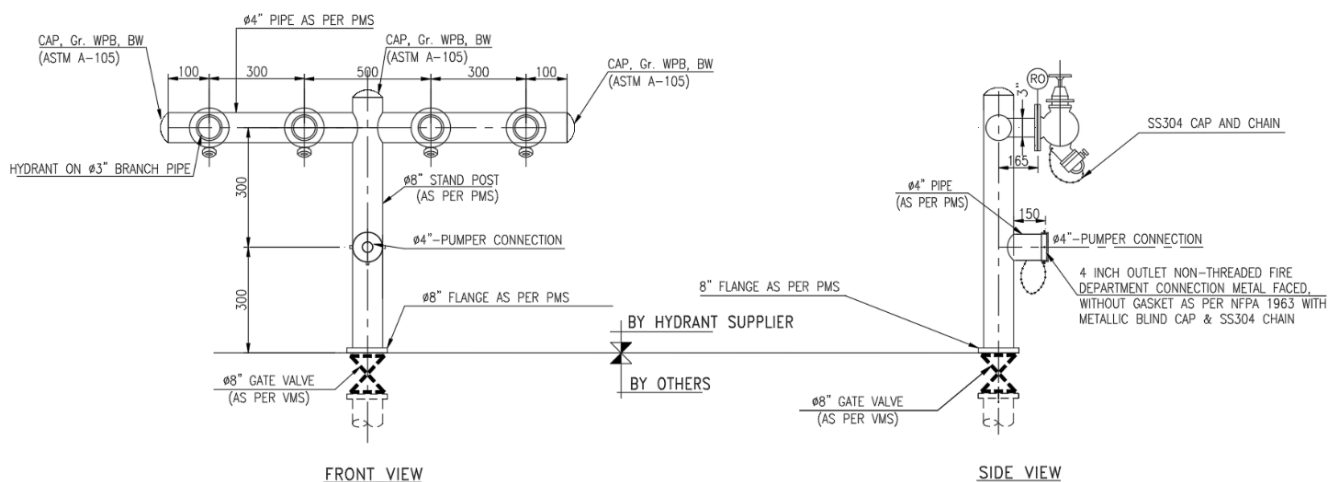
WAY HYDRANT WITH PUMPER CONNECTION
